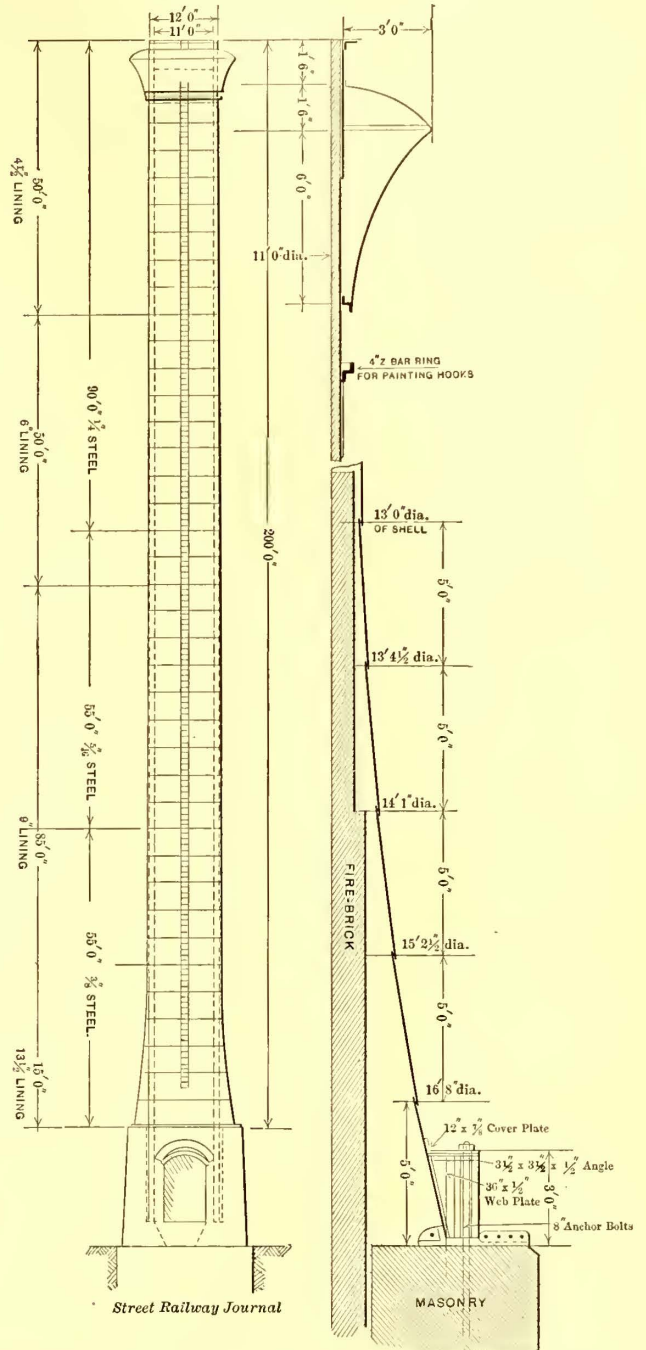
ELEVATION AND VERTICAL SECTIONS OF STACK.
